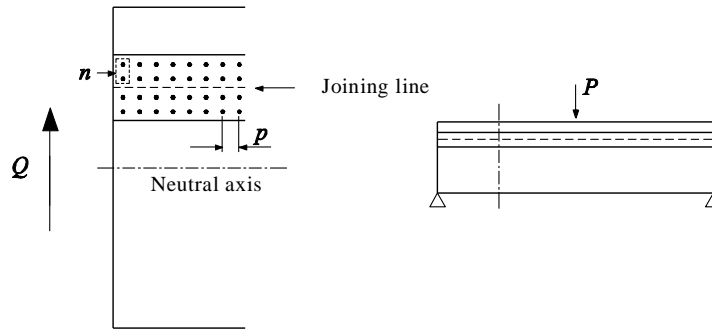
High-Strength Bolted Friction-Type Joint That Horizontally Connect Plates, Subjected to Shearing Force due to Bending
